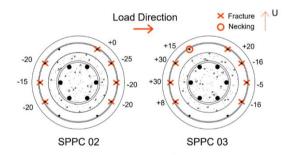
Failure mode of the longitudinal prestressed wire
